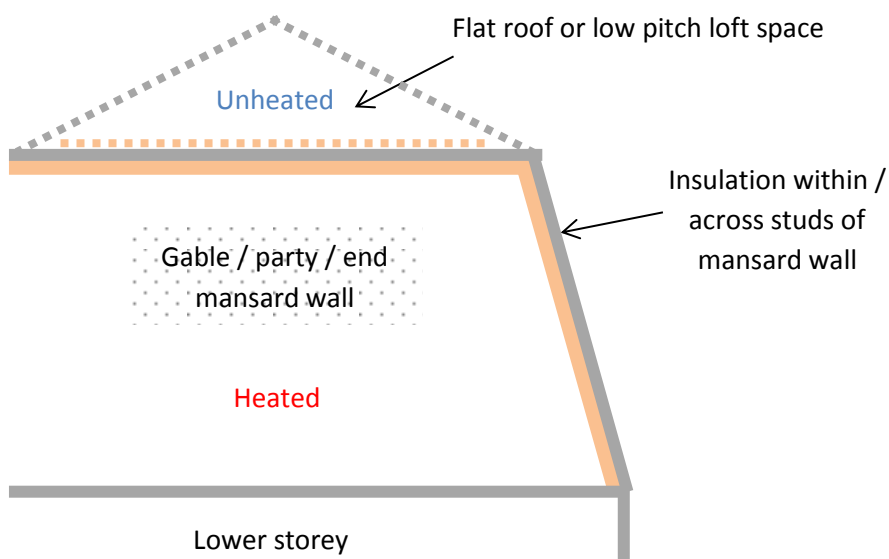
Cross-section showing basic elements of mansard roof construction with insulation
